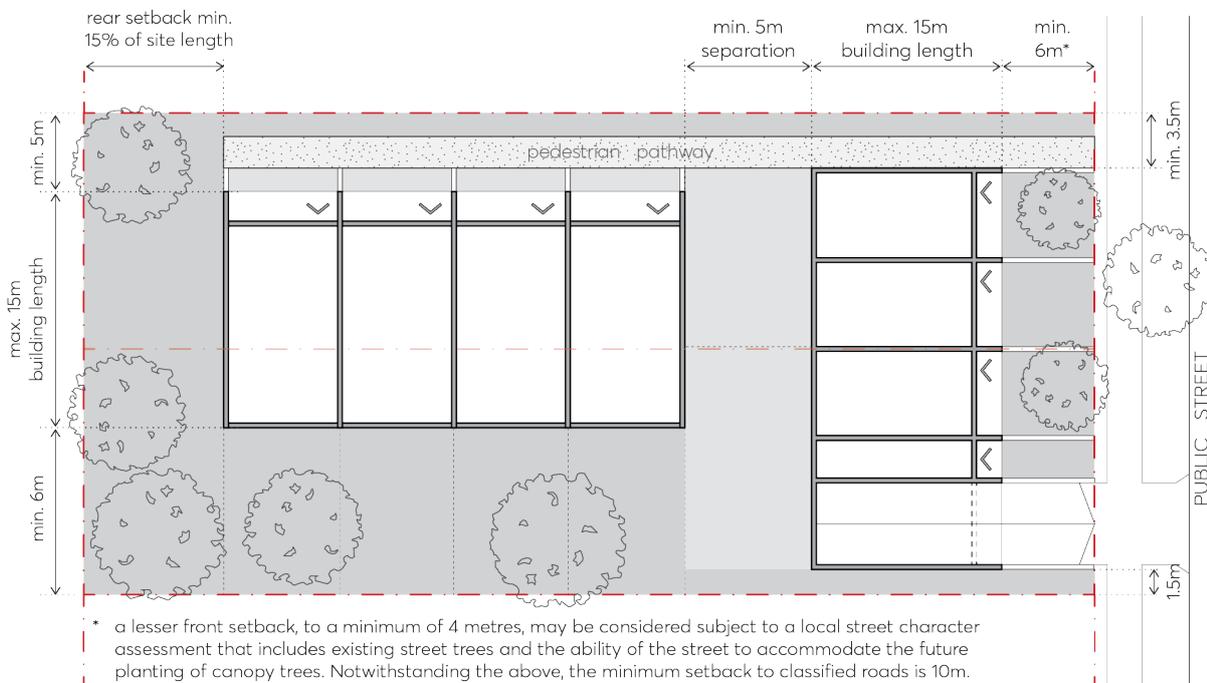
Townhouses L-Configuration Setbacks and Separation
